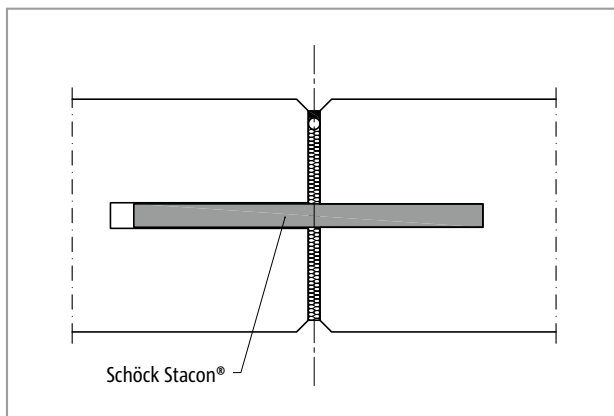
Schöck Stacon®: Expansion joint formation in in-situ concrete
